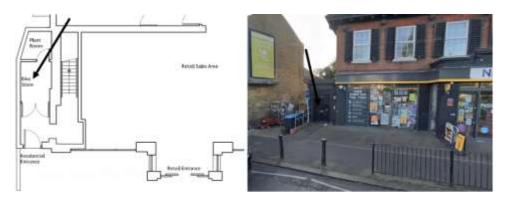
Cycle parking proposed (left) and picture of cycle parking location (right)
